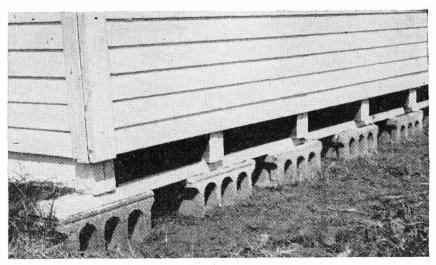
Correct setting of concrete blocks for temporary foundation. Flat sides of blocks are down to give full bearing on ground. Two-inch planks over blocks equalize load. Setting blocks at right angles to joists reduces tipping.
